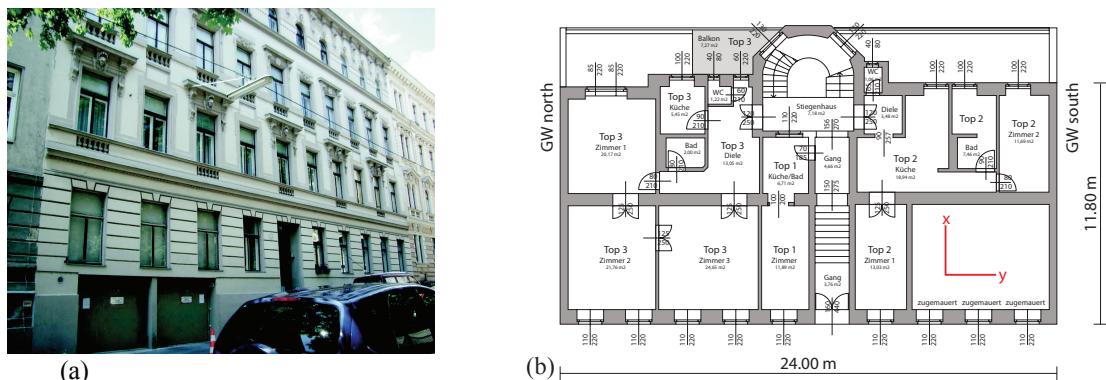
Object “Riglergasse 10” located in the City of Vienna, Austria. (a) Building front facing the street Riglergasse. (b) Floor plan of the ground floor
